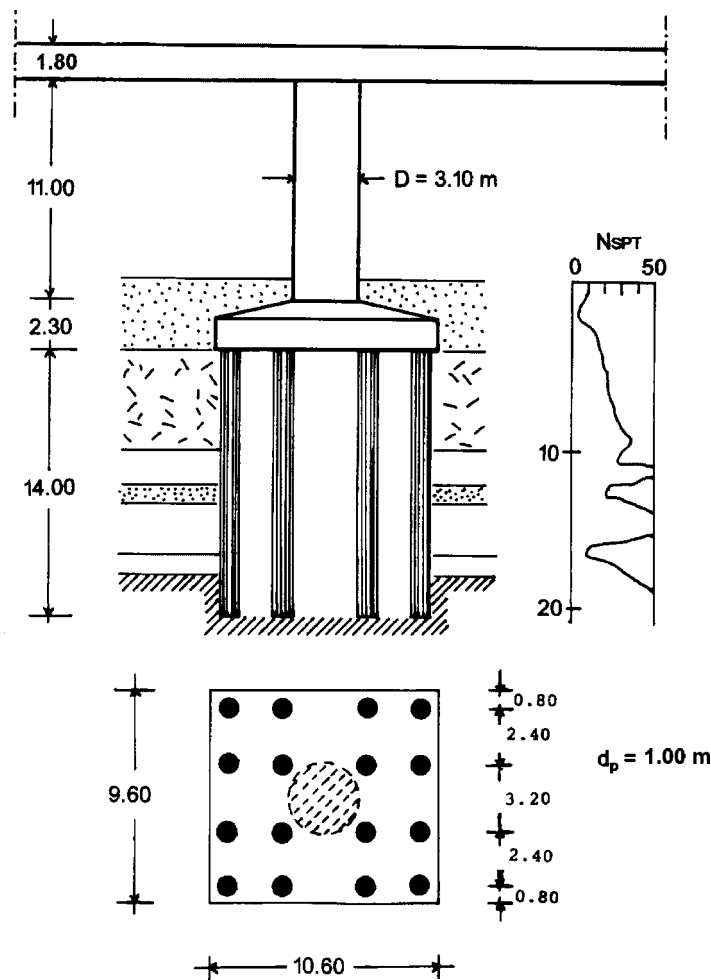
Geometric characteristics of a typical collapsed pier in Fukae section.
